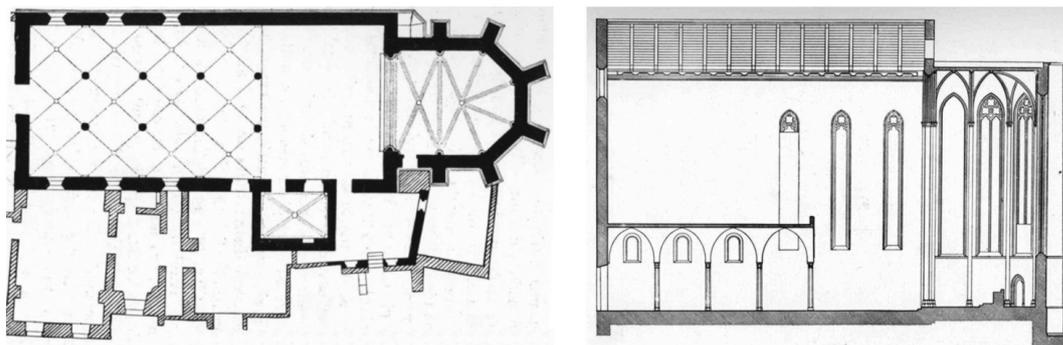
Plan and longitudinal section of the church of St. Mary of Donnaregina after Chierici's restoration
